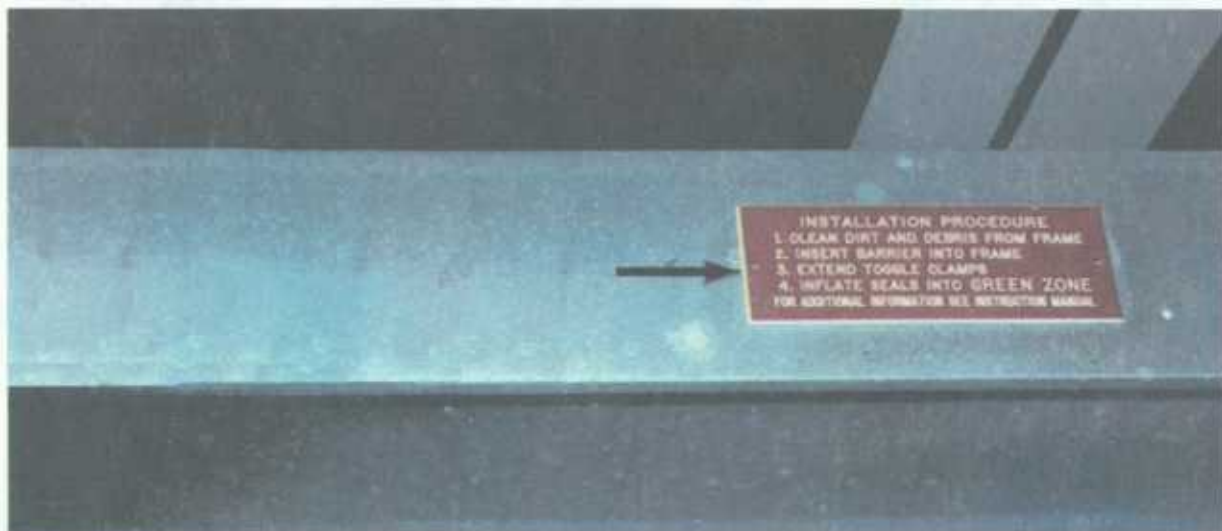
Dry floodproofing often requires extensive human intervention. Note the detailed instructions affixed to this flood shield.
